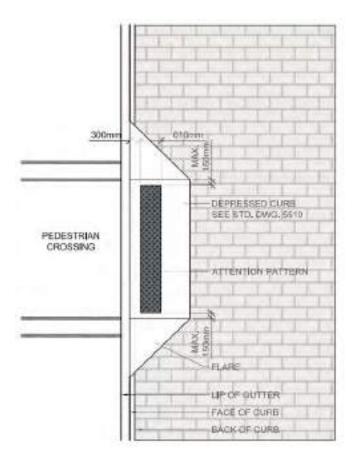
Tactile Warning Surface Indicator Layout, Mid-Block Crossing
